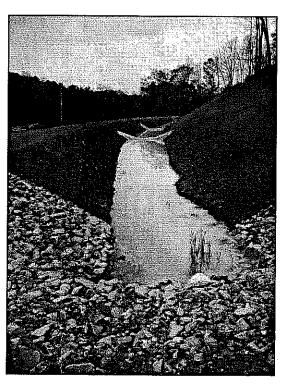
DOWNSTREAM VIEW OF SETTLING POND, BAFFLES, AND OUTLET PIPE FROM THE LIMESTONE POND
